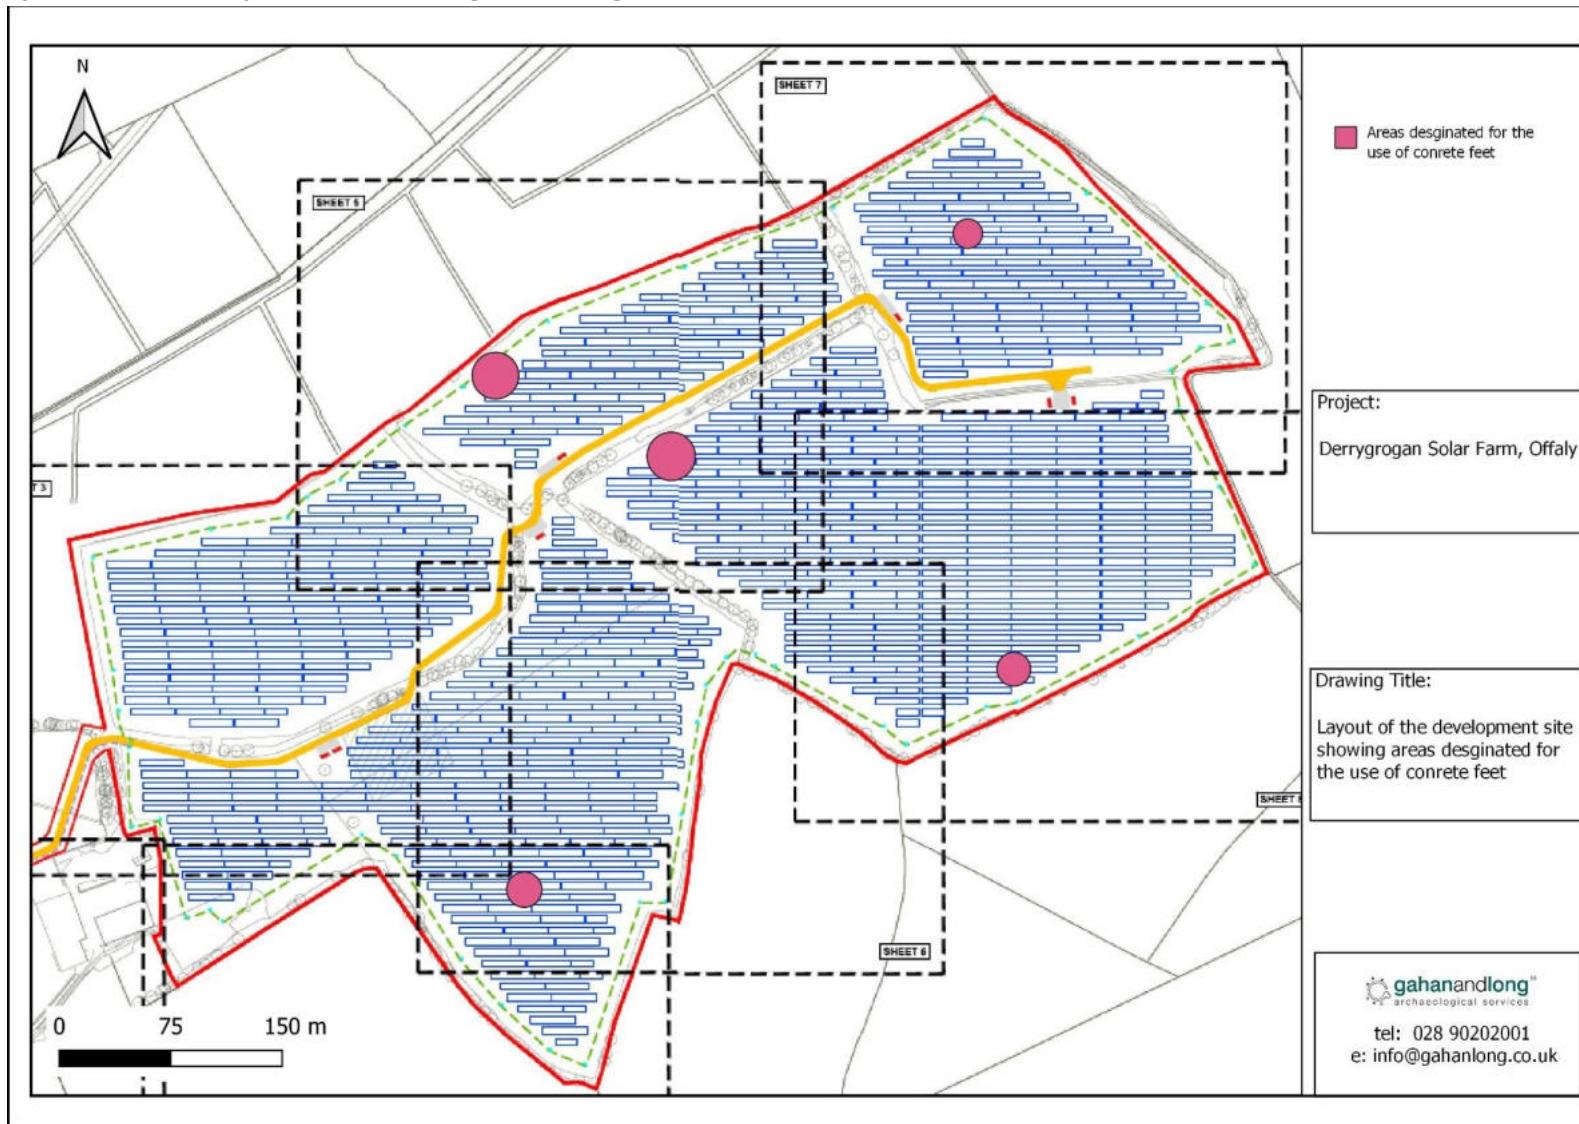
layout of the development site showing areas designated for the use of concrete feet
